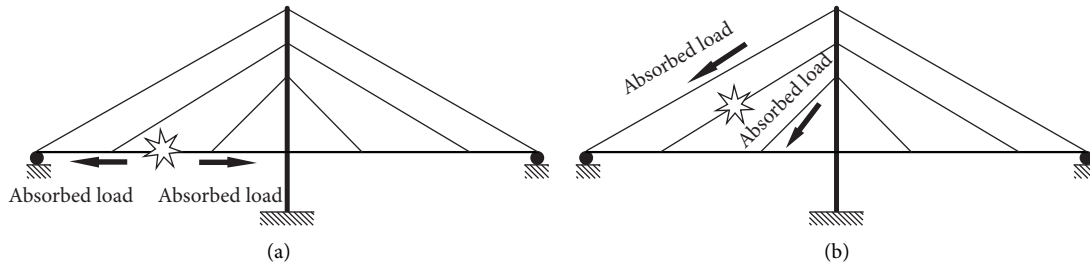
Failures of individual members of the cable-stayed bridge: (a) load transfer after girder failure; (b) load transfer after cable failure.
